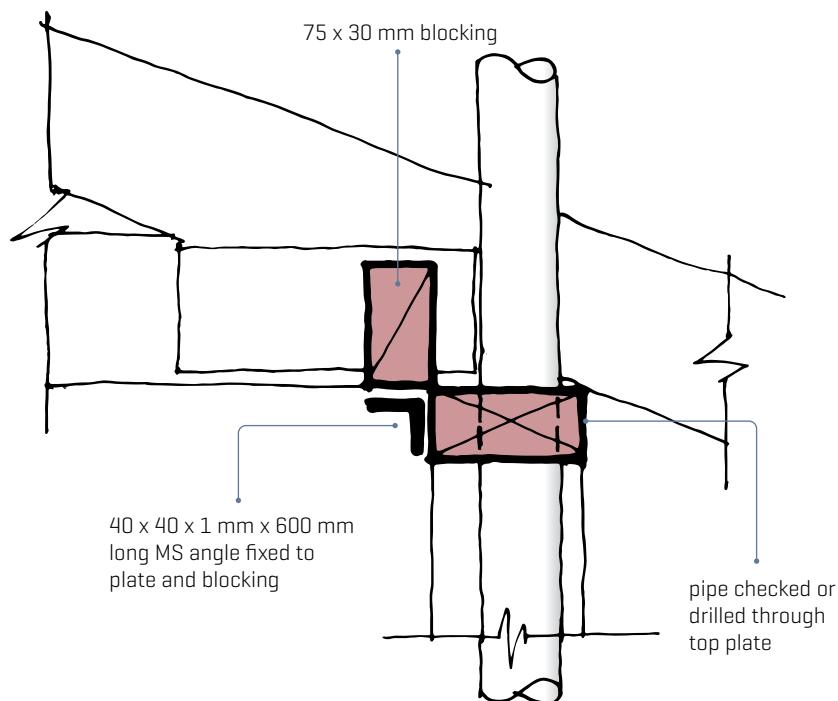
Strengthening the eaves where pipe is cut through top plate.
